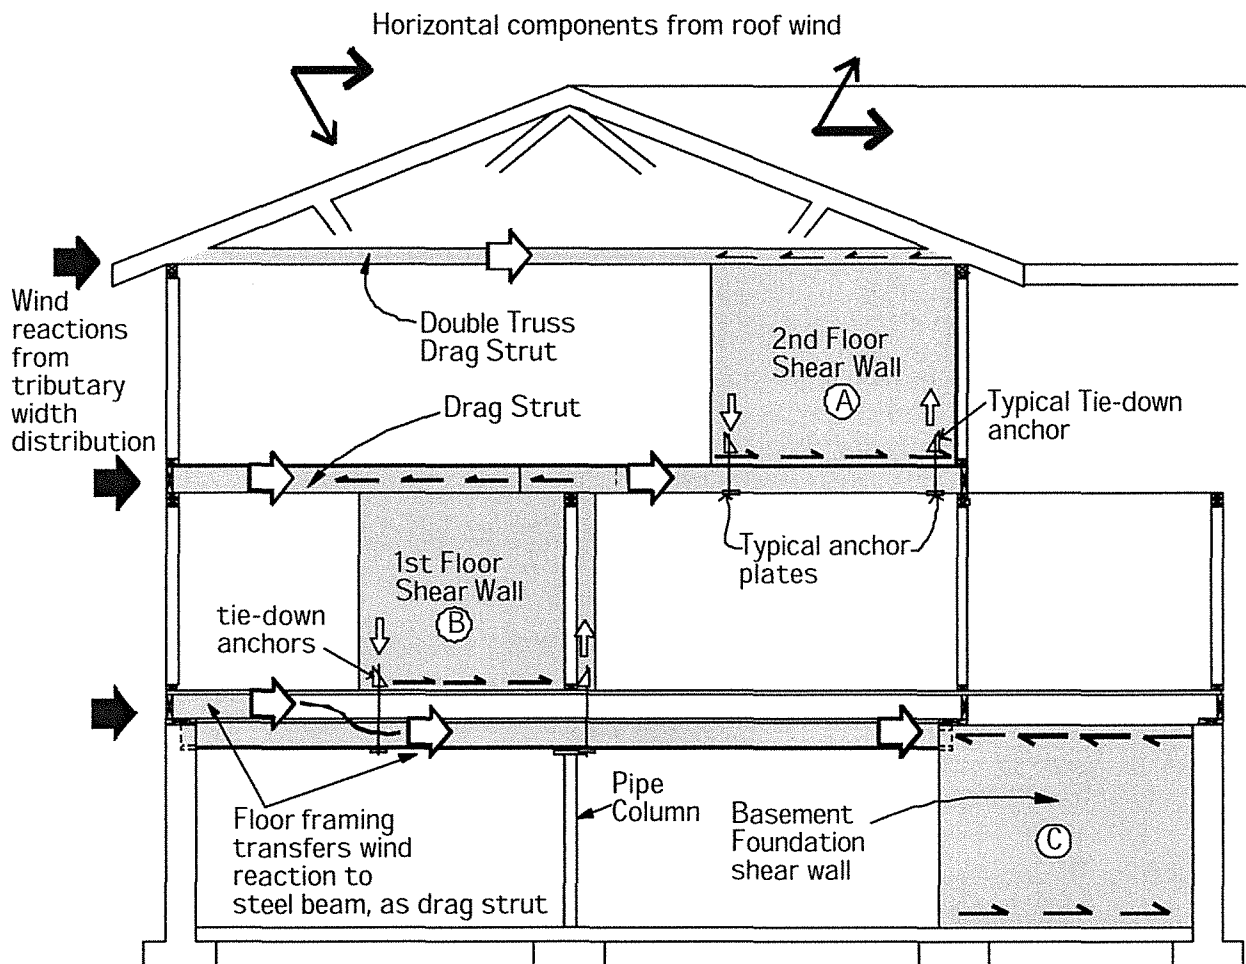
Section at Interior Offset Shear Walls (within same plane)
